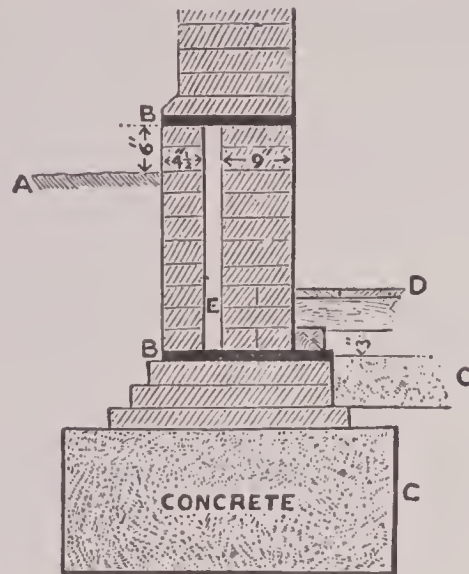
A dry foundation. A, ground level. B, B, damp-proof courses. C, C, concrete. D, floor. E, hollow in the wall.
